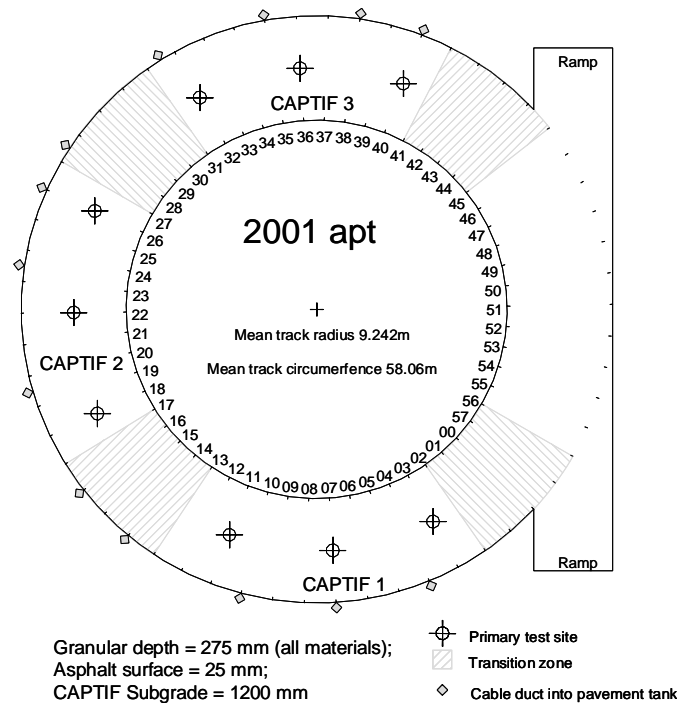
Layout of CAPTIF pavement test sections for the 2001 test.
